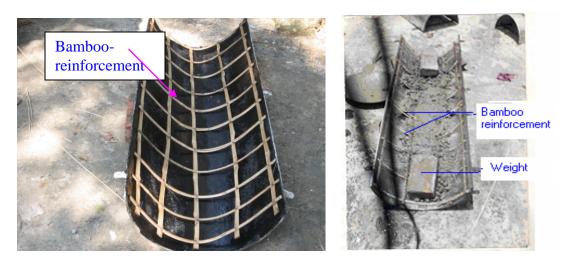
Bamboo-reinforcement & concrete placed in the moulds
